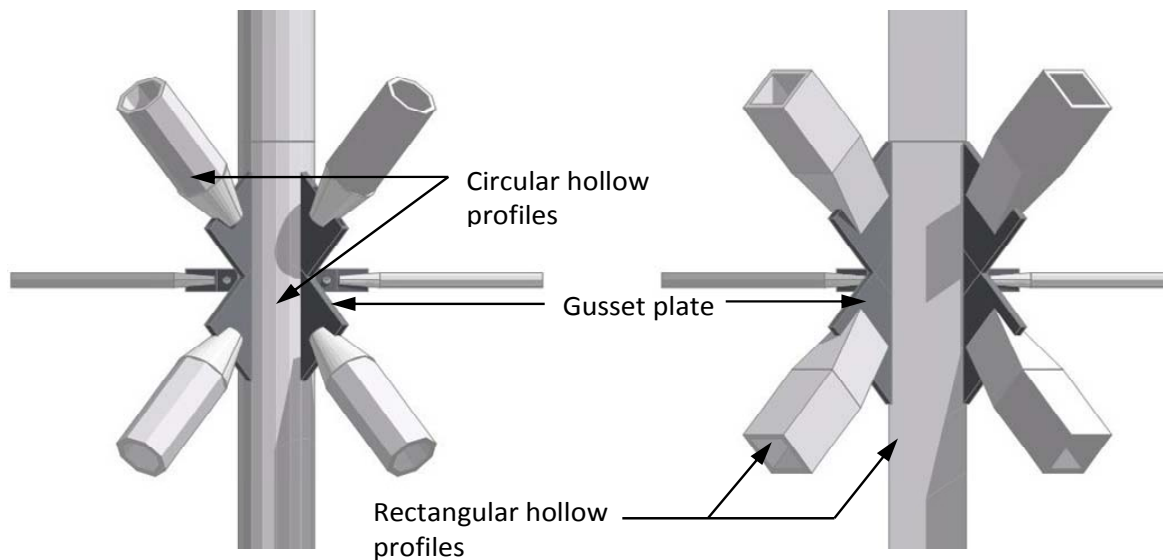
Structural joints for circular and rectangular hollow profiles
